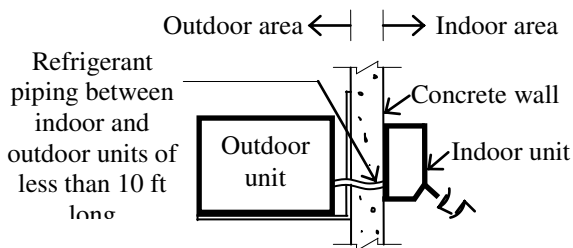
Back-to-back installation of indoor and outdoor units of split type air conditioner.
